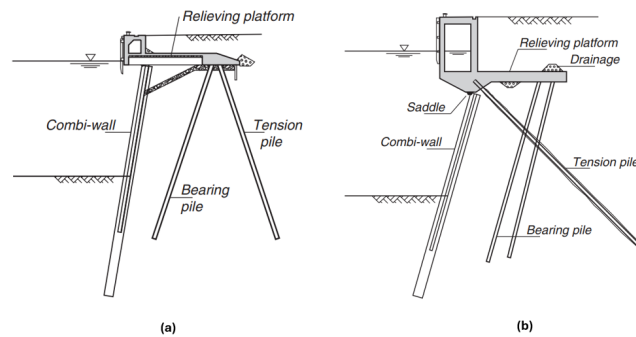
Layout of Quay Walls with Relieving Platforms: (a) Low Relieving Platform (b) High Relieving Platform [10]
